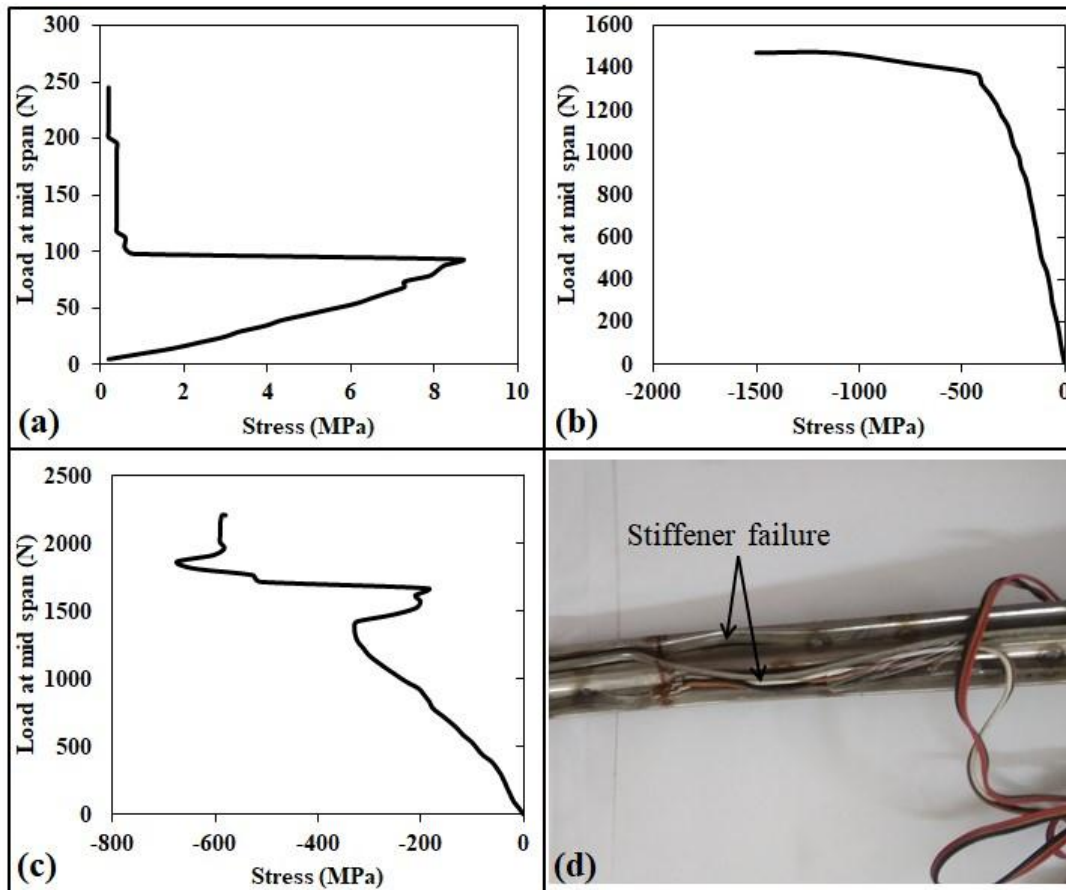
Stress in stiffeners from strain gauges pasted on stiffeners of, (a) pipeline with central stiffener, (b) pipeline with central stiffeners and two stiffeners at the ends and (c) pipeline with longitudinal continuous stiffeners (d) Failure of weld connection between pipe and stiffener in pipe with longitudinal continuous stiffeners.
